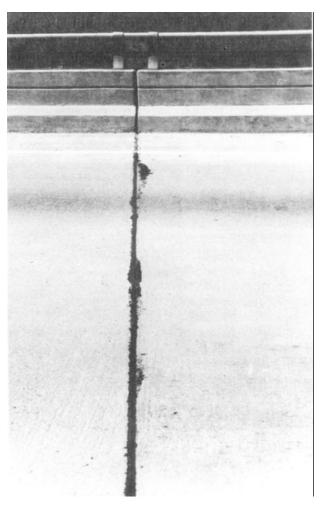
Expansion joints. (Sheet 1 of 2)
